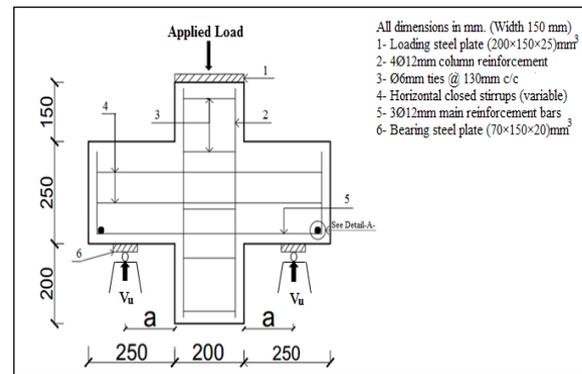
Dimensions and Reinforcement Details of the Tested Specimens
